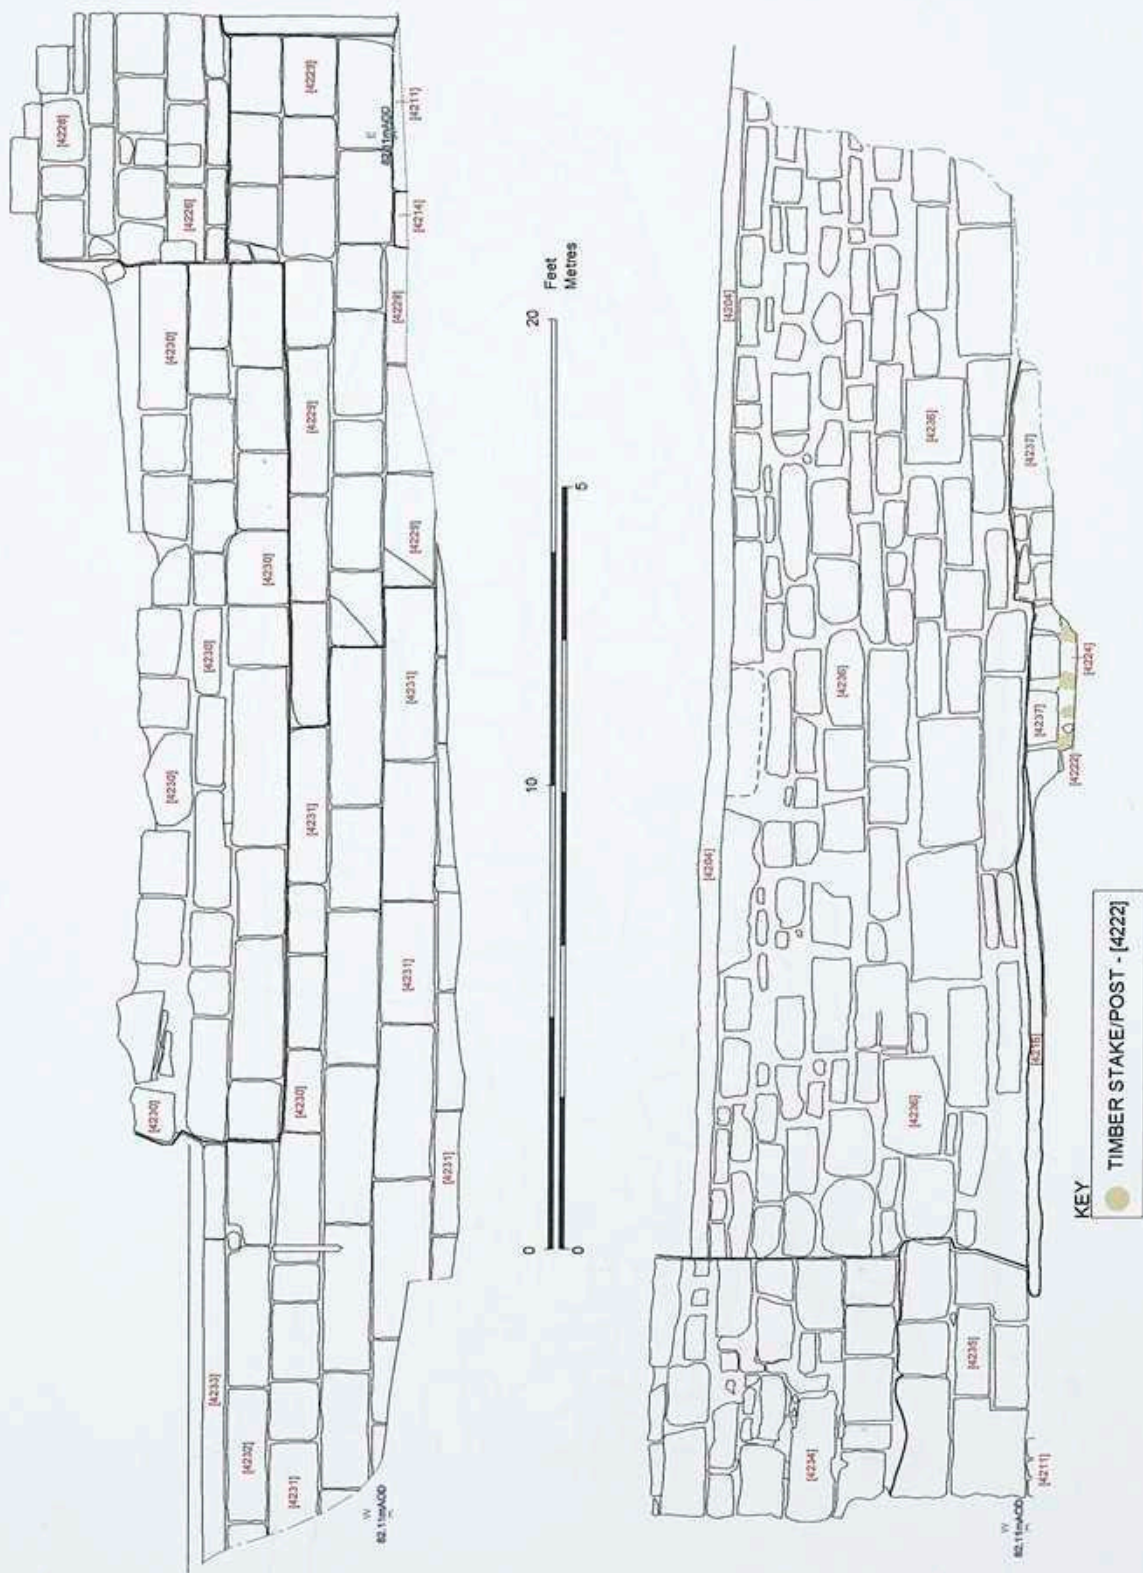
Trench 42, north wall of leet inlet. Scale (1:50).
